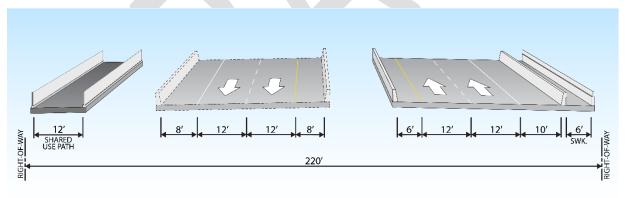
Preferred Alternative Typical Section Hollomans Branch Bridge
